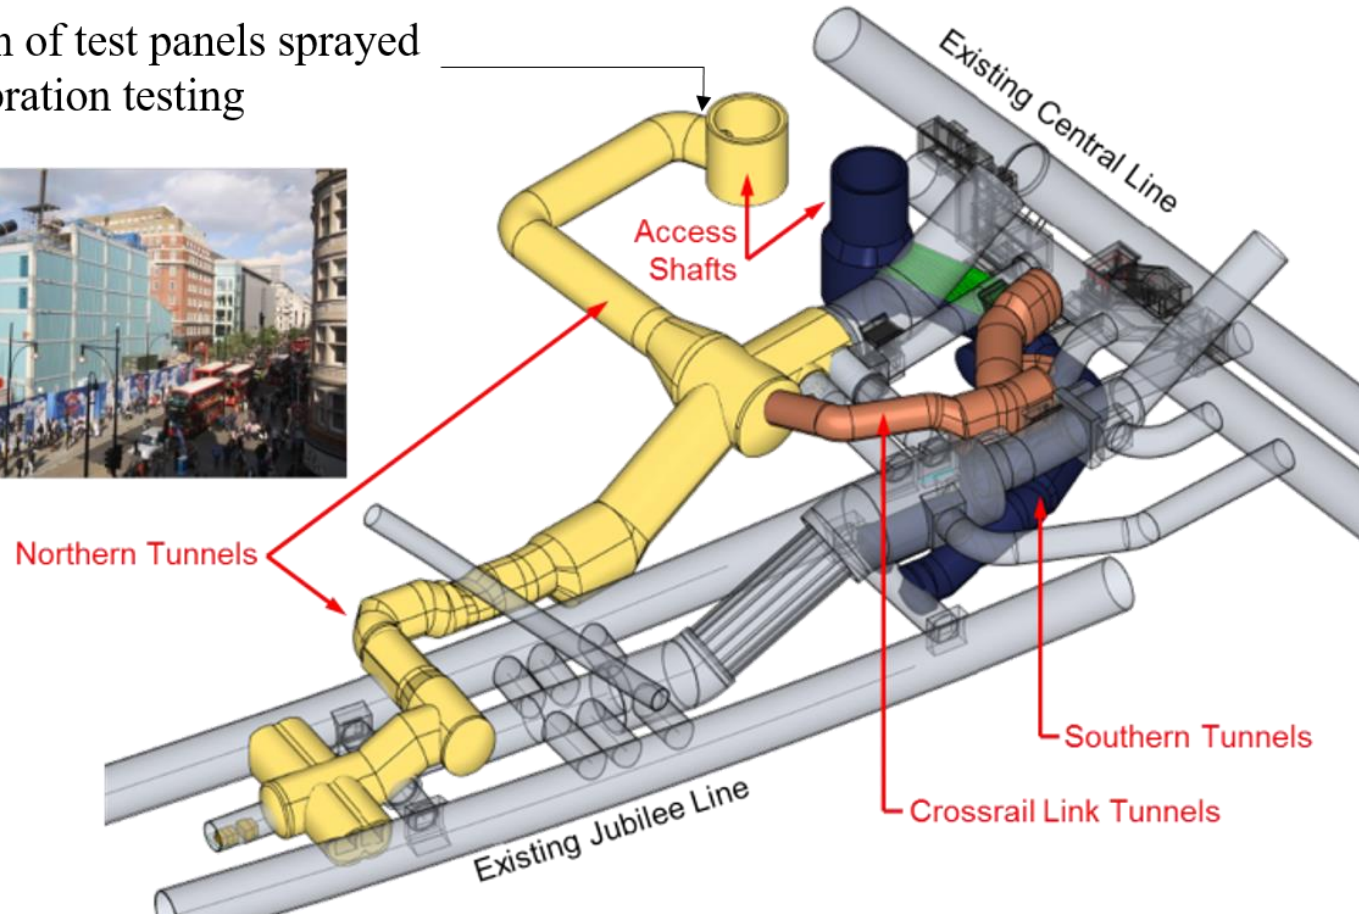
3D layout of existing and new upgrade works for Bond Street Station Upgrade (BSSU) site (Picture courtesy Dr Sauer and Partners)
